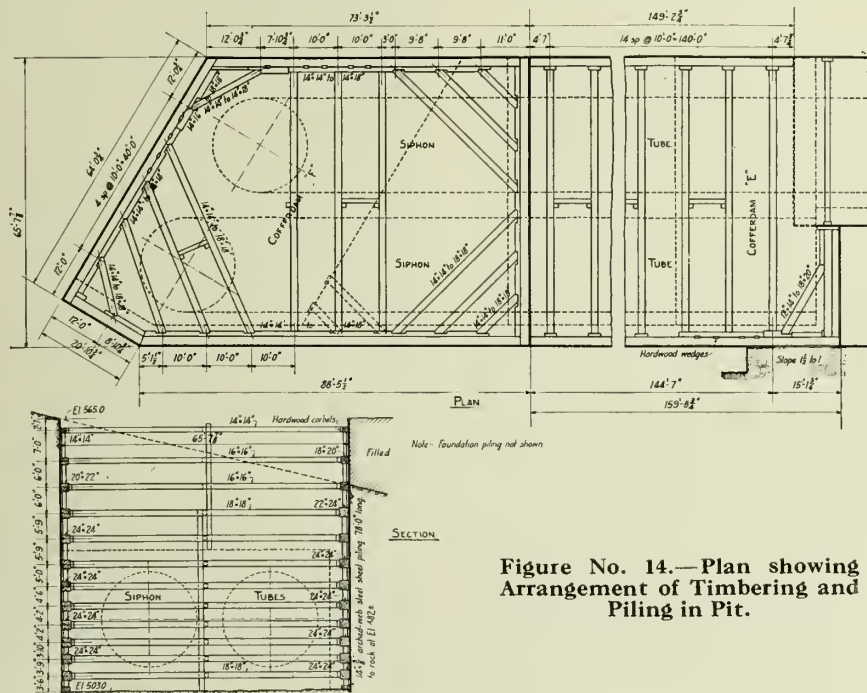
Plan showing Arrangement of Timbering and Piling in Pit.
